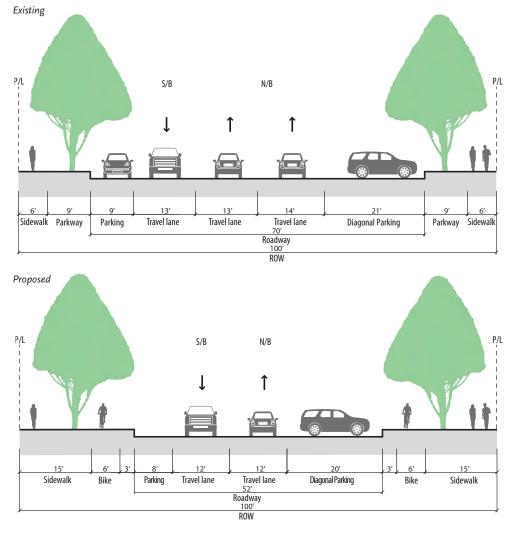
Typical Cross-Section for Glendora Avenue, Foothill Boulevard to Ada Avenue.
